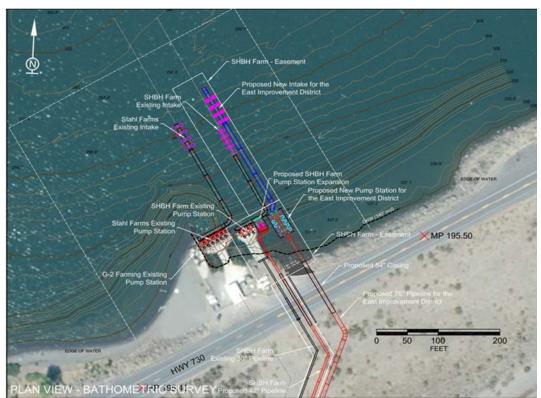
Project Site. Existing Pump Stations and Proposed New Intake Expansion.
